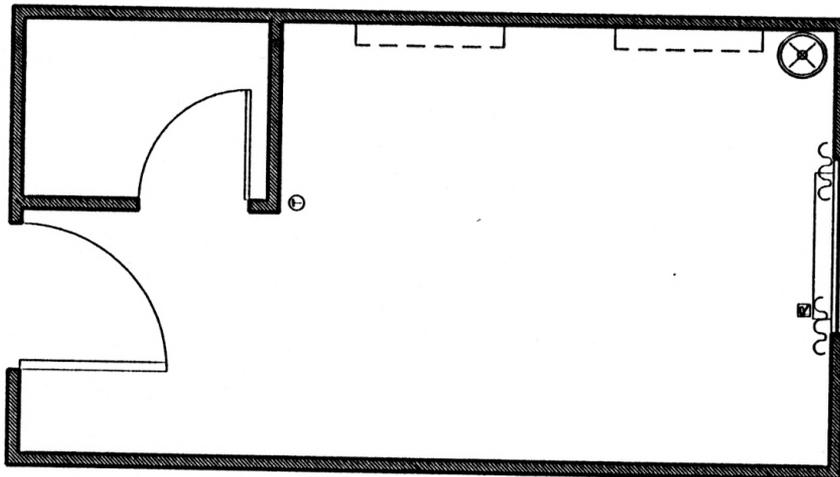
Plan of Skilled Care Residents' Room - Site 3.
